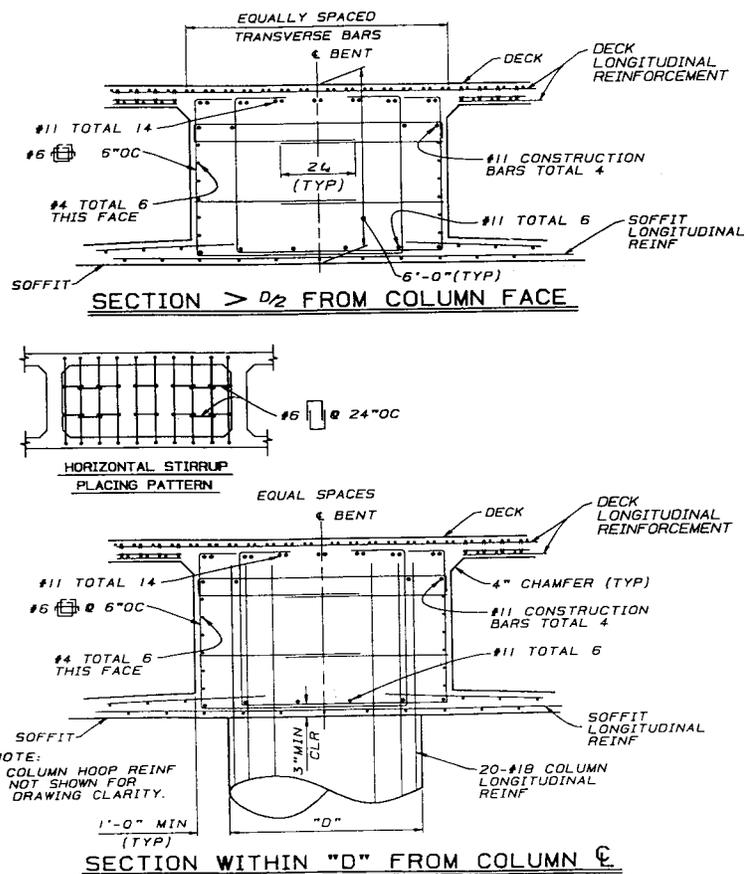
Example cap joint shear reinforcement — skews 0° to 20°.
